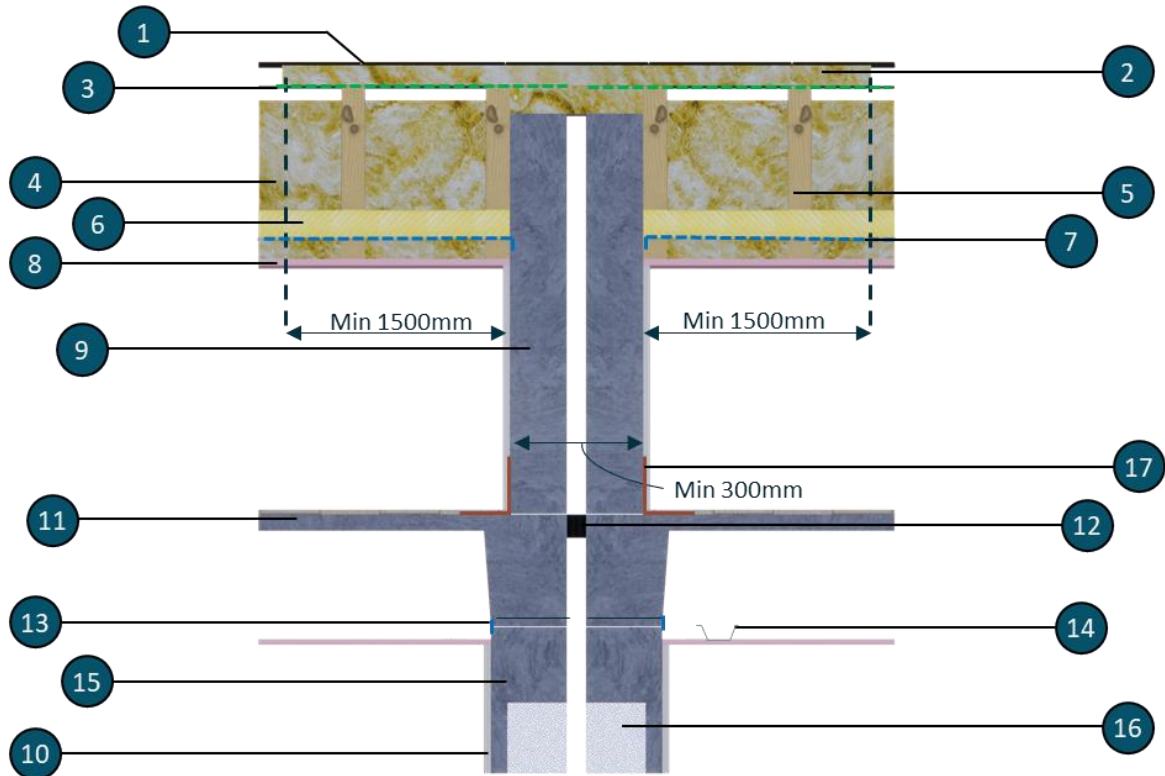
Compartment wall to roof junction (non-habitable attic space)
